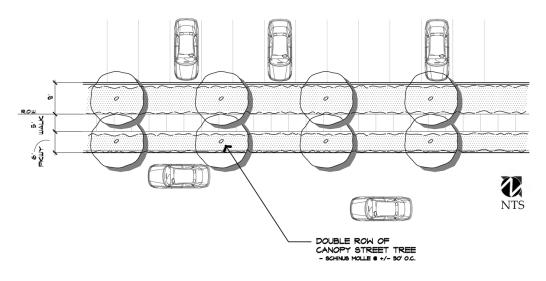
Ontario Center Parkway (East of Via Asti) Public Streetscape Section and Plan
